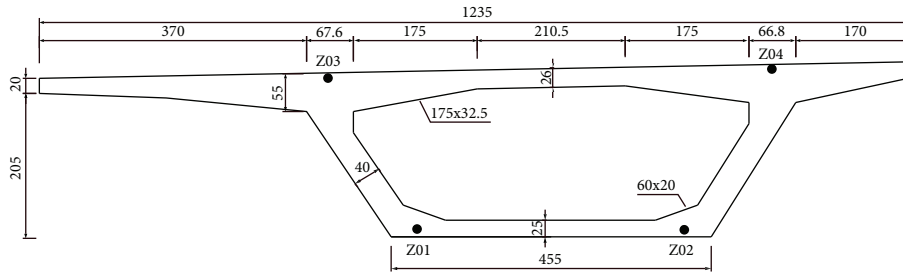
Stress measuring points arrangement of the mid-span section (cm).
